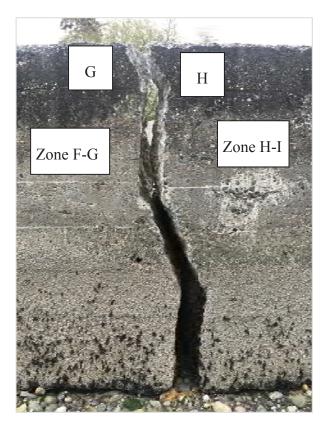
Zones F-G & H-I. Source: Reid Middleton Site Visit 05/31/2017
